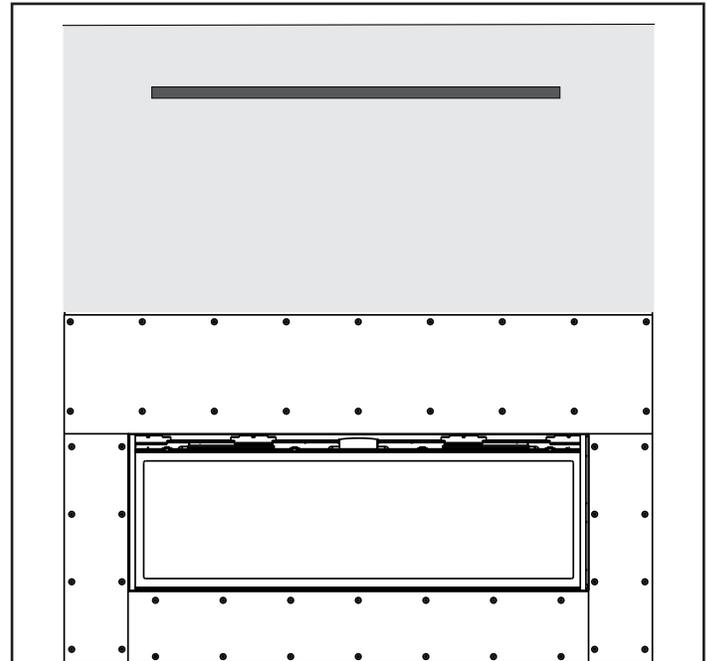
HeatFlo Kit Installed (Flush Wall Shown)
